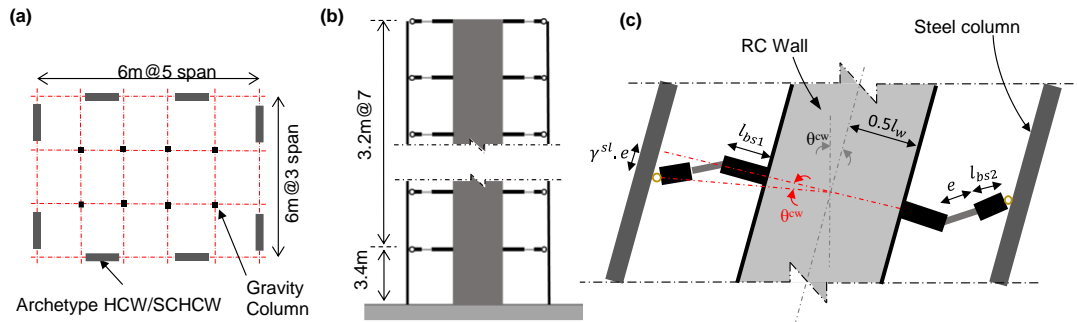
(a) Plan view of the intended eight-story structure, (b) Elevation of the intended eight-story structure, (c) Idealized deformed shape of a SCHW under lateral loading.
